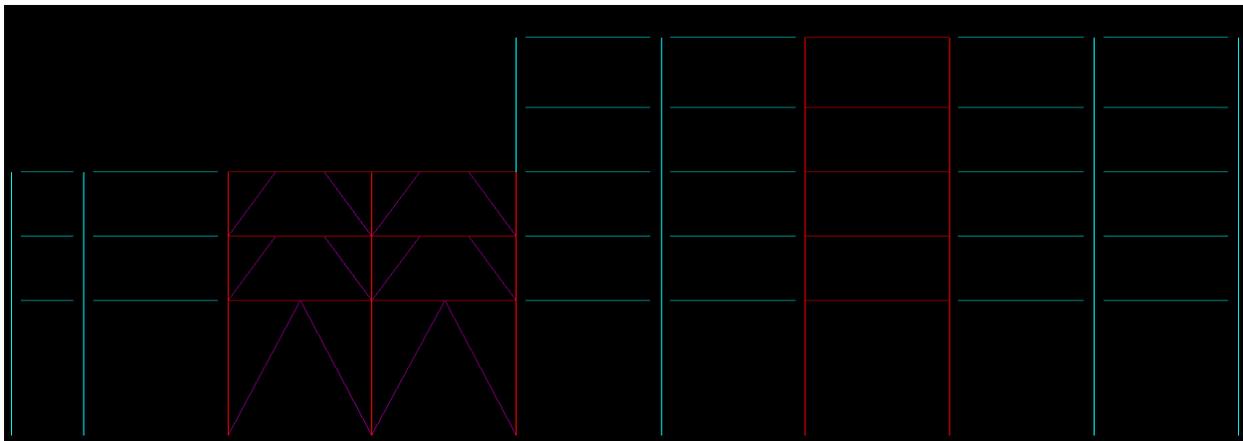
Moment Frame Elevation: Specially modeled frames seen to the left
